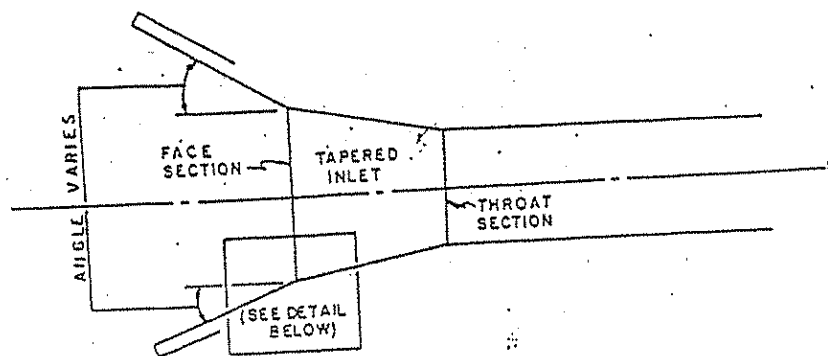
Inlet edge conditions, face section, rectangular tapered inlets.
